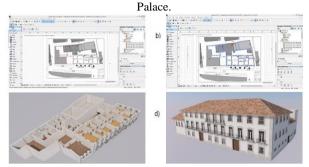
Buildings that were modelled providing architectural and indoor details (LOD-3, LOD-4).
